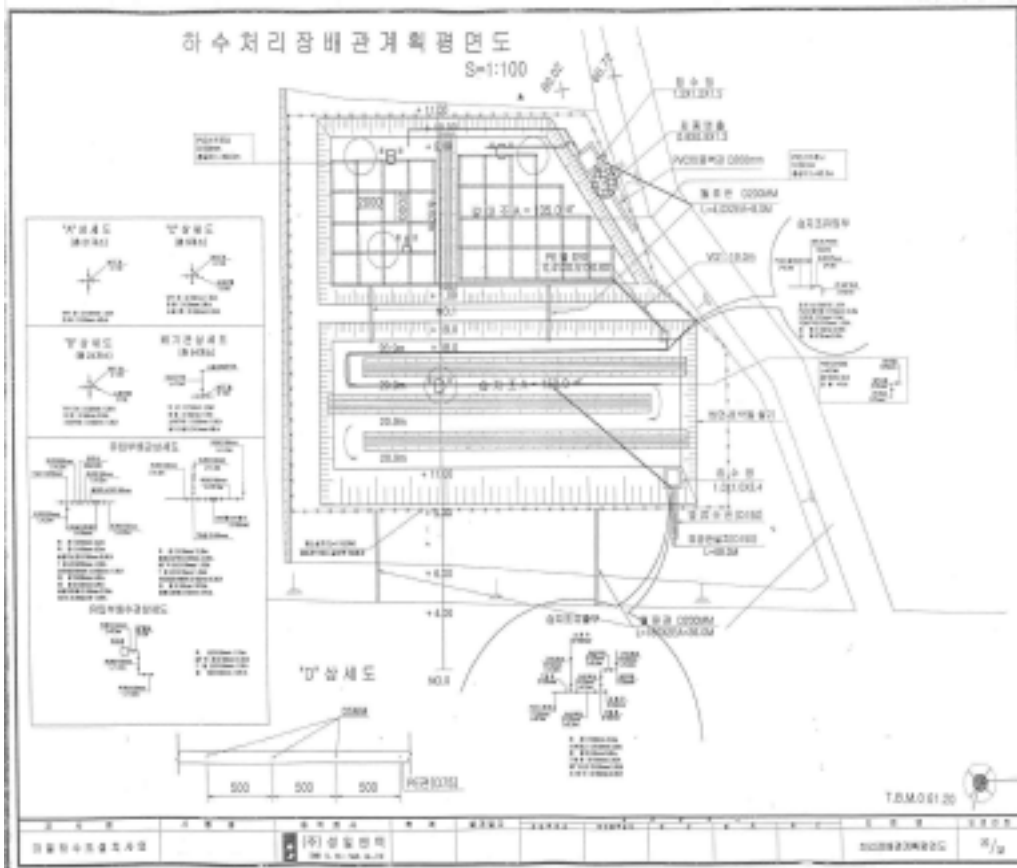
Draft of piping plan in sewage treatment plant.
